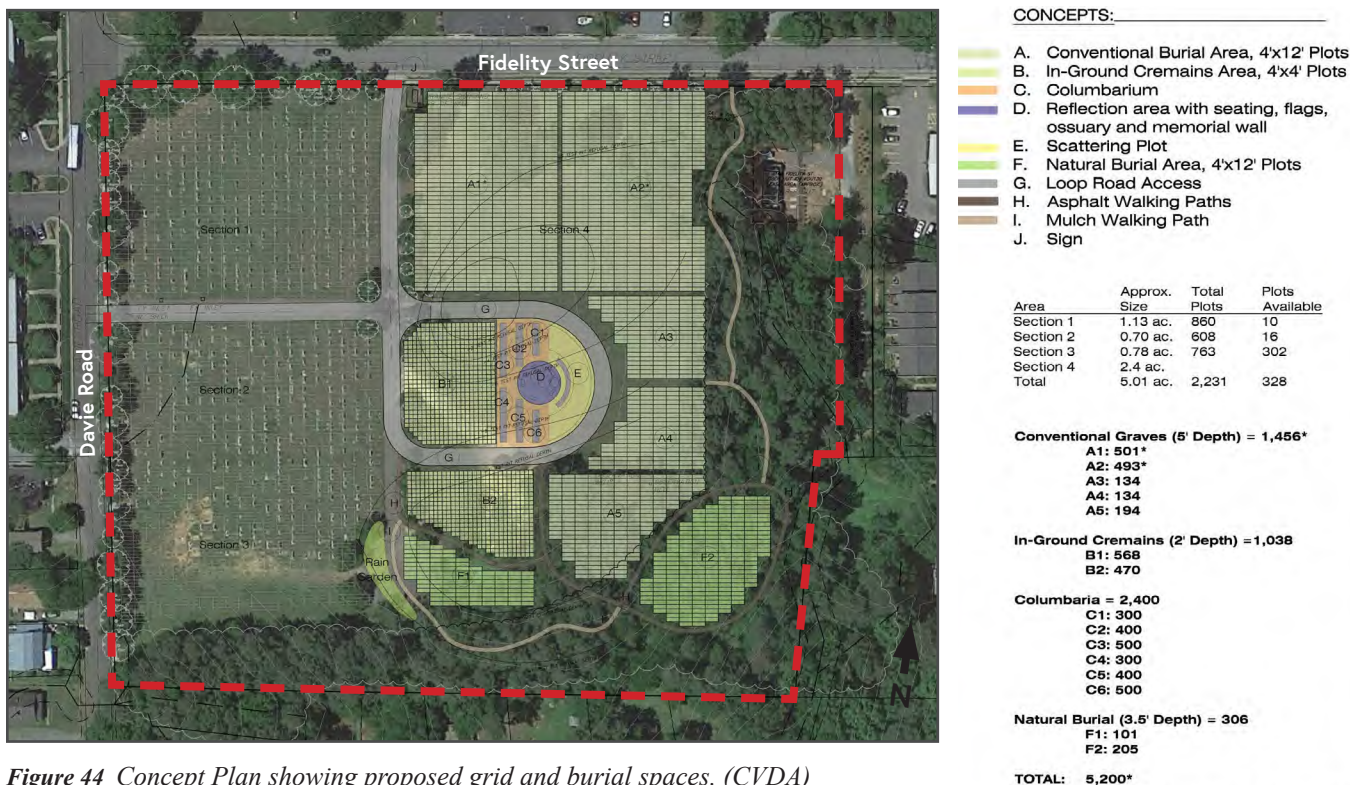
Concept Plan showing proposed grid and burial spaces. (CVDA)
